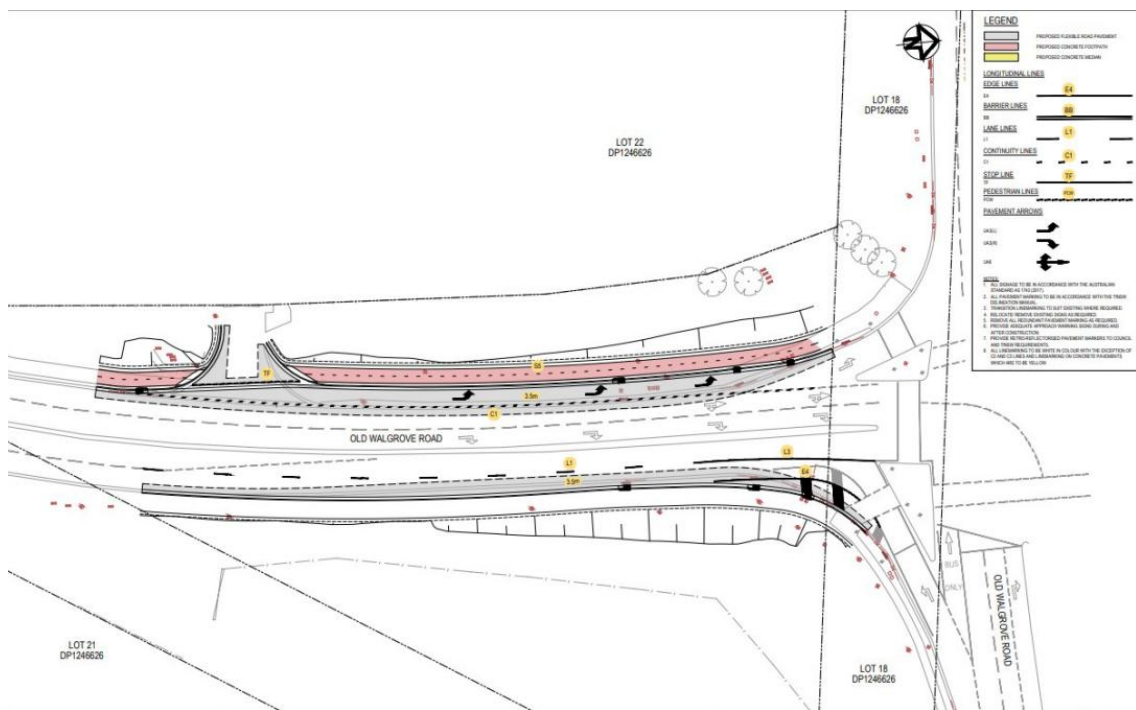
Approved intersection upgrade works at Old Wallgrove Road/Lenore Drive (Source: SSD 37486043 Consent)
